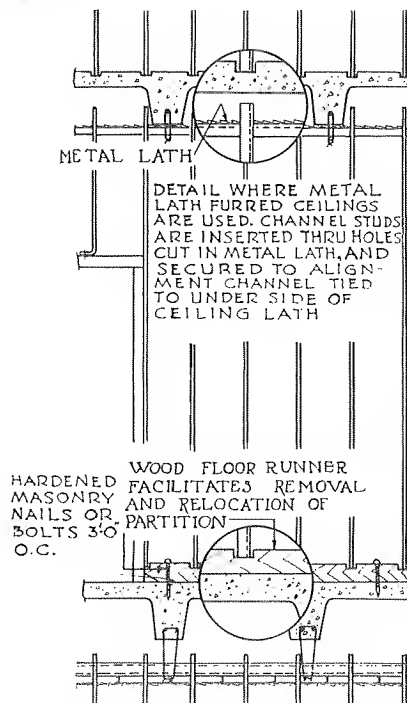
(ABOVE) Upper ends of studs secured to furred Metal Lath Ceiling under concrete joists.
